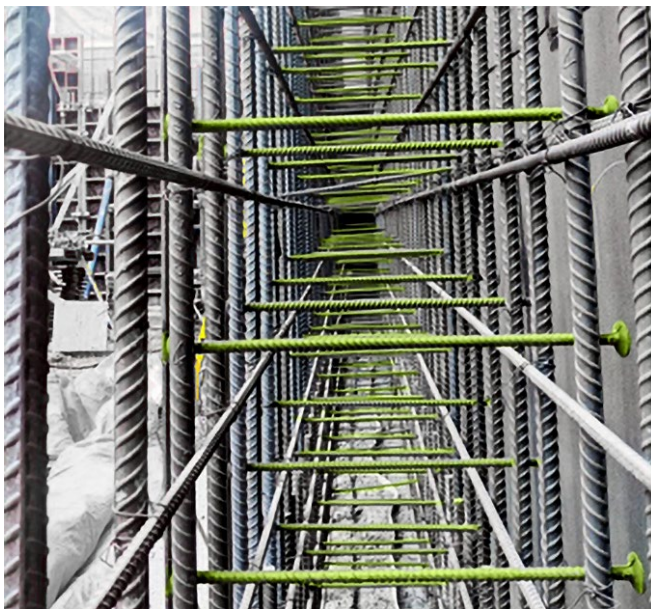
CONCRETE SHEAR WALL USING PSB® HEADED ANCHORS AS SHEAR REINFORCEMENT REPLACING THE STIRRUPS
